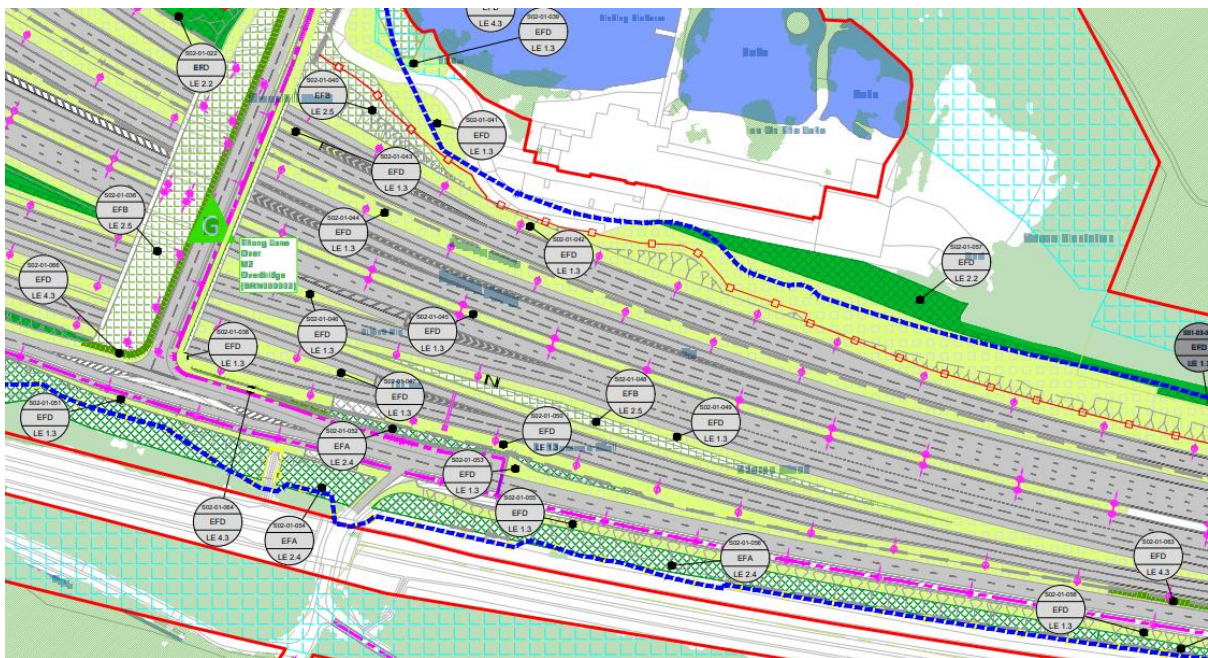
Extract from Environmental Masterplan, Section 2, Sheet 1, east of Thong Lane over A2 bridge, showing 20 lanes of traffic at western end of AONB.
